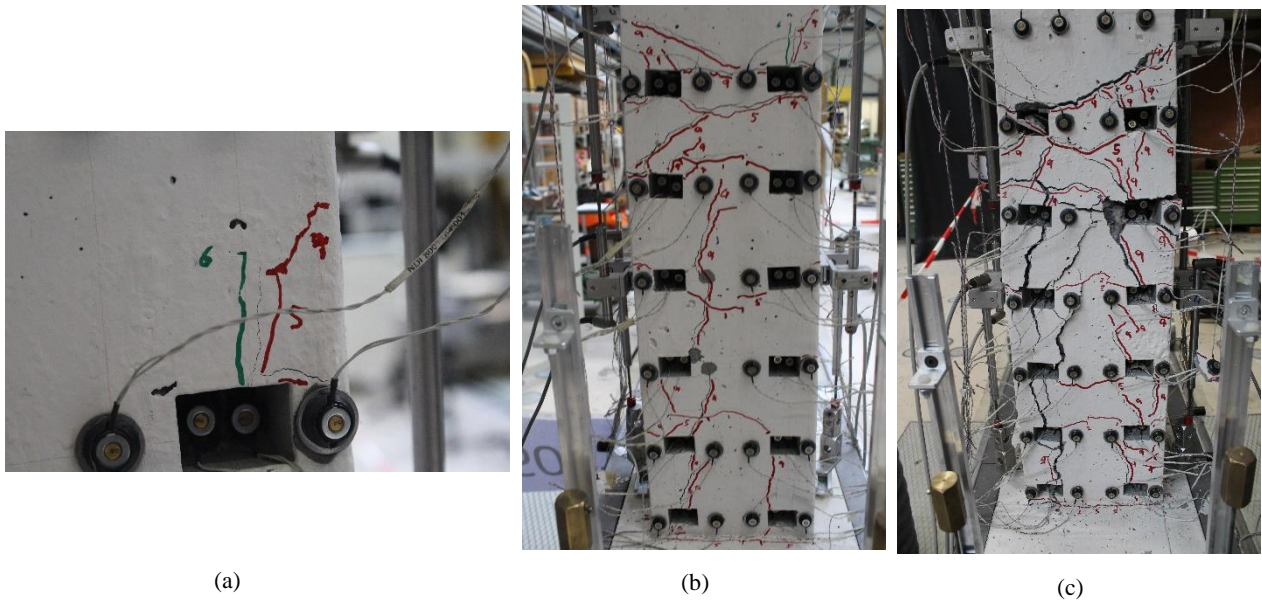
Pictures at different load levels Lap-P3; (a) Vertical Splitting cracks near top splice; (b) Failure of the first lap splice at the first cycle to 6 mm; (c) Failure of the remaining lap splices through vertical splitting cracks
